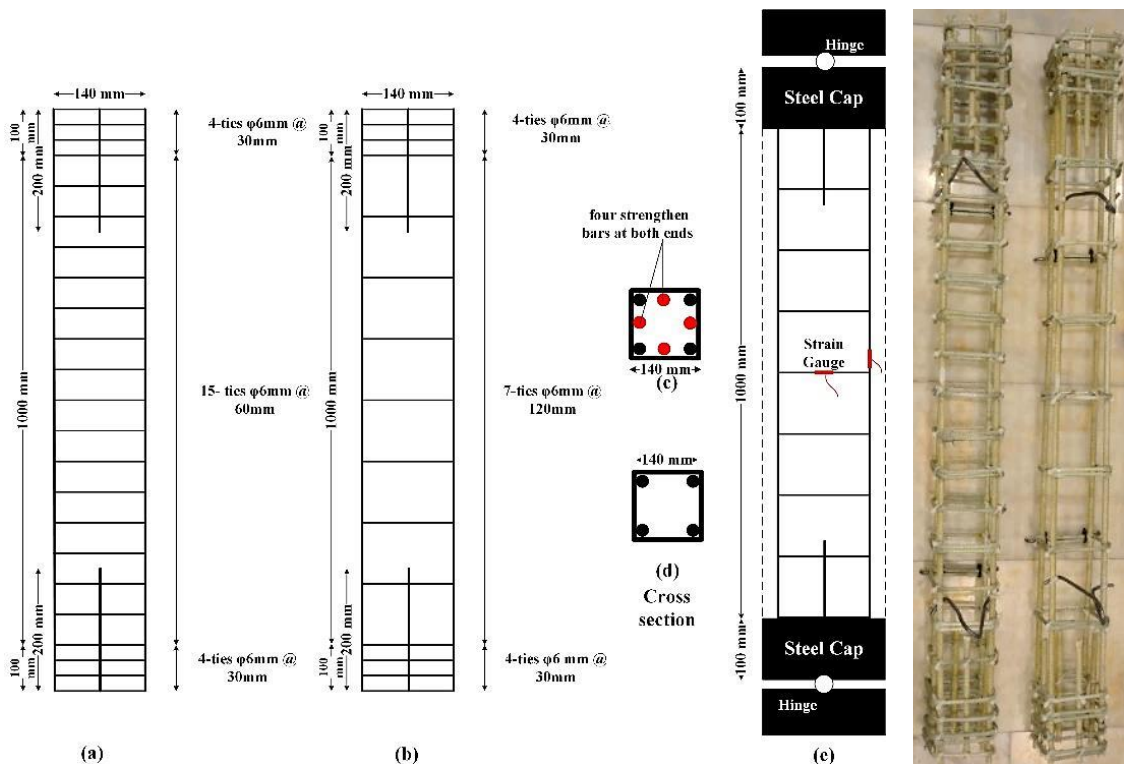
Specimen's dimension: a), b), c), d) reinforcement details of the columns and their cross-section, e) RC-Column with steel cap connection, f) cages of columns.
